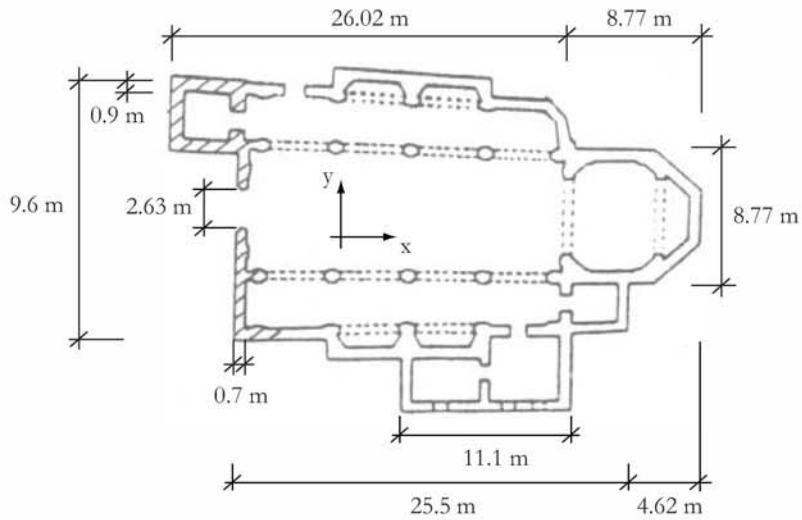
Plan of Santo Stefano a Cesclans, with dimensions (the plan is taken from [Do 94]).
